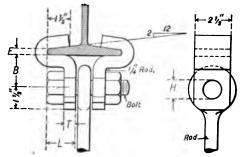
DETAIL OF I-BEAM CLAMP (OPEN TYPE),
